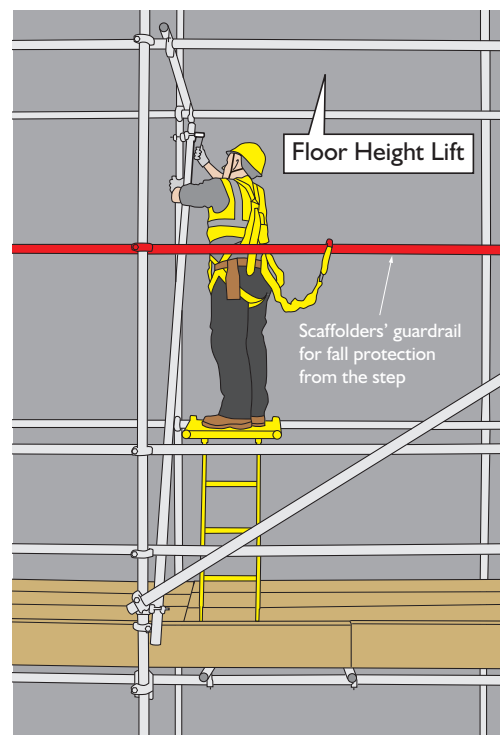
Tall Lifts – Scaffolder using a scaffolders' step to form a floor height lift
